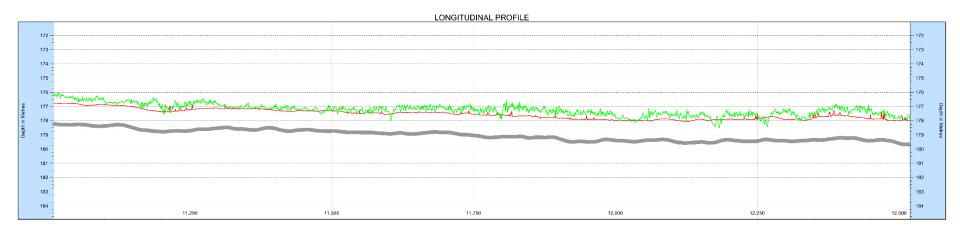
PL4556 As-built alignment sheet KP11.010 to KP12.520
